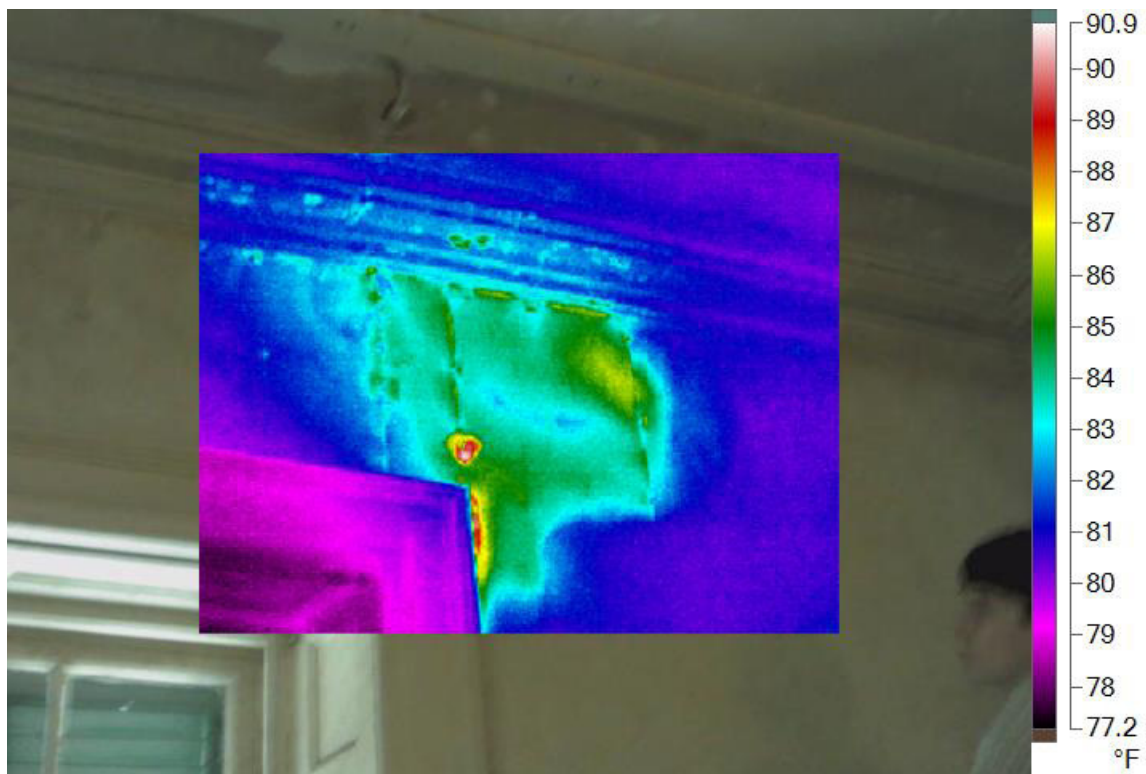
Southeast chamber, south wall: Analysis above window showing visible temperature differences between wallpaper detachment (green) and cracking (blue).
